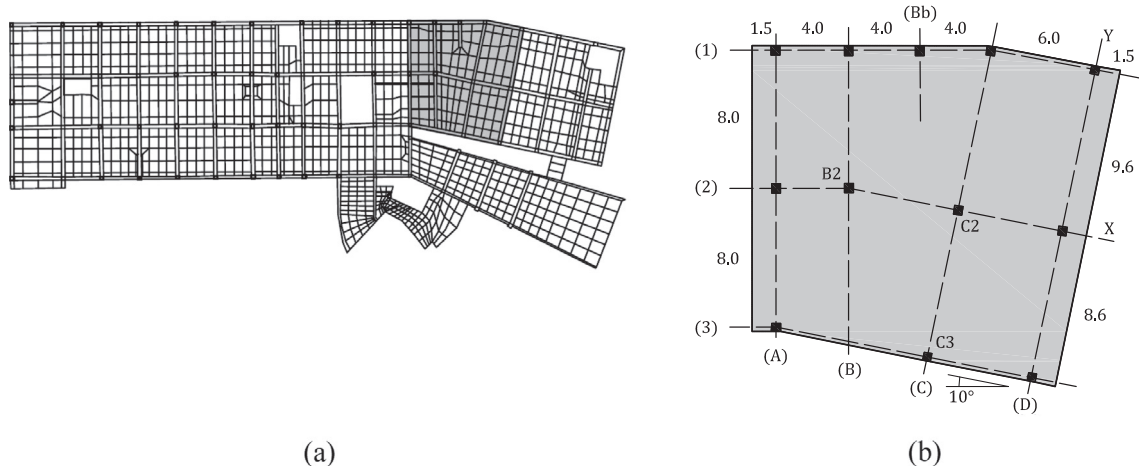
Flat slab concrete building case study, adapted from CS [35]: (a) plan view of the office building (shaded area corresponds to area of study), (b) span layout of the modelled part of the structure.
